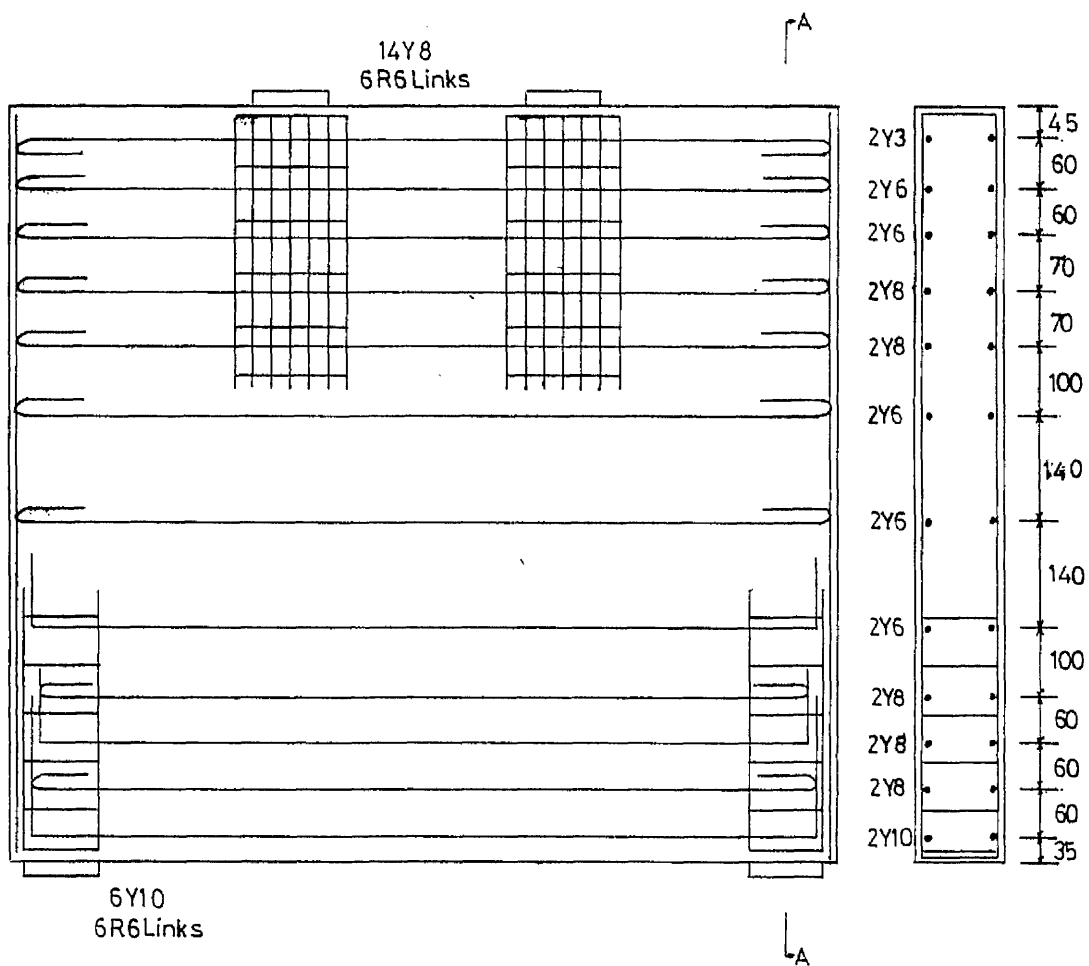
ARRANGEMENT OF REINFORCEMENT FOR BEAM B2. SECTION A-A.
